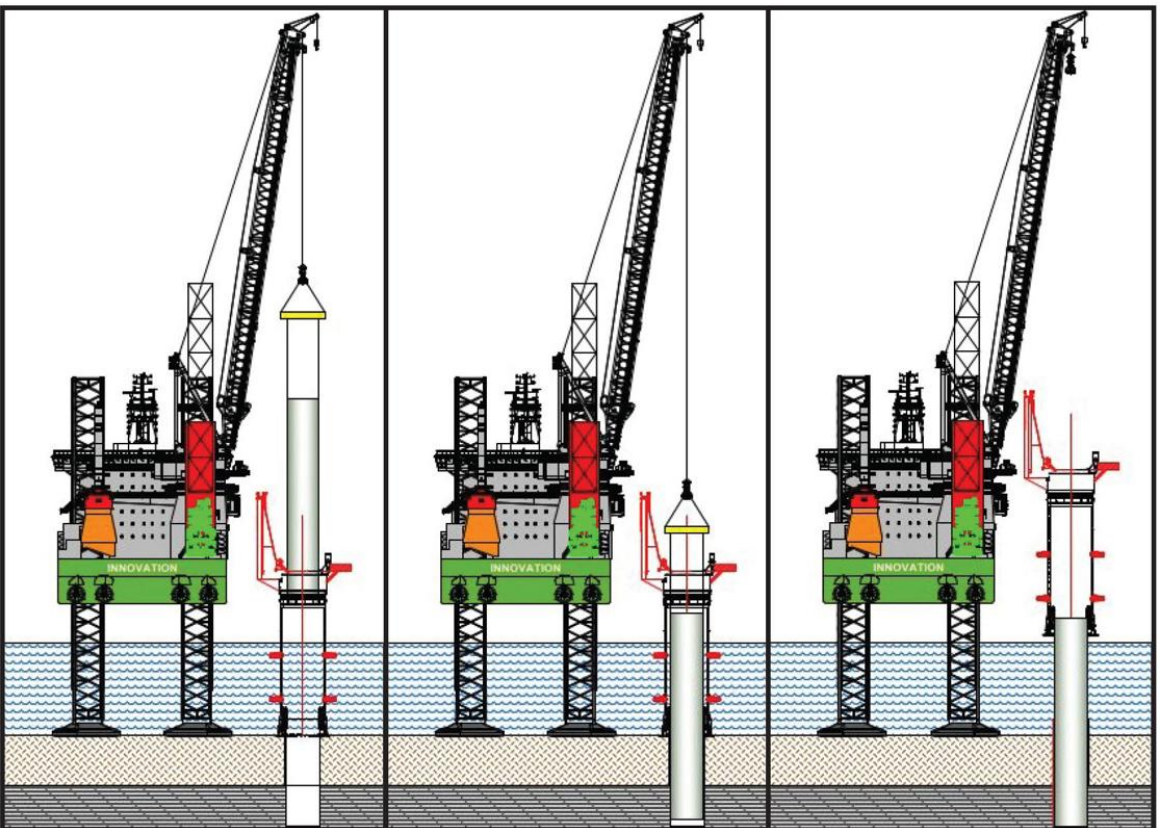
A-2: Installation of foundations (steps 4-6): 4. Insertion of monopile; 5. Grouting of monopile, 6. Removal of MODIGA.
